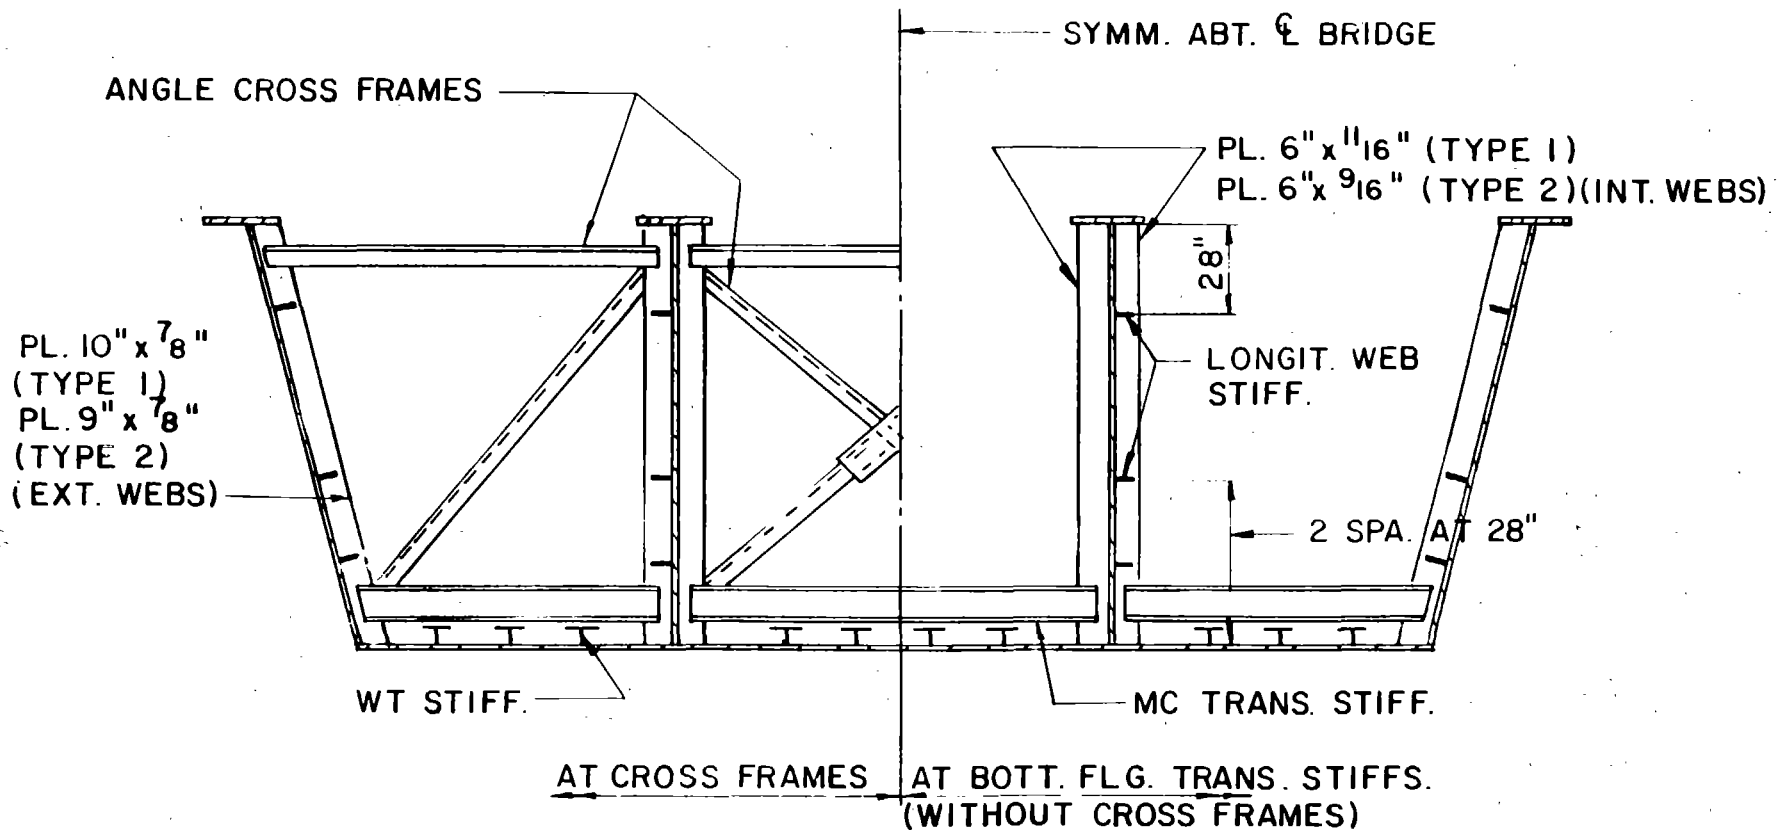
TYPICAL CROSS SECTION—AASHTO DESIGN INTERMEDIATE SPAN
